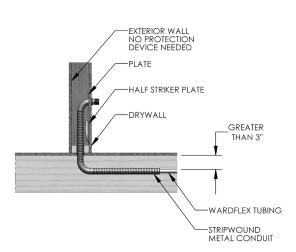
Figure 4.13 Termination fitting for an appliance connection with stripwound conduit providing extra protection inside the wall and floor cavities.
